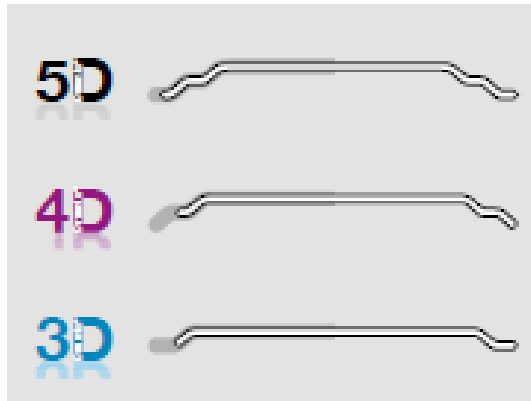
Types of hooked ended steel reinforcement (“Bekaert,” n.d.)
